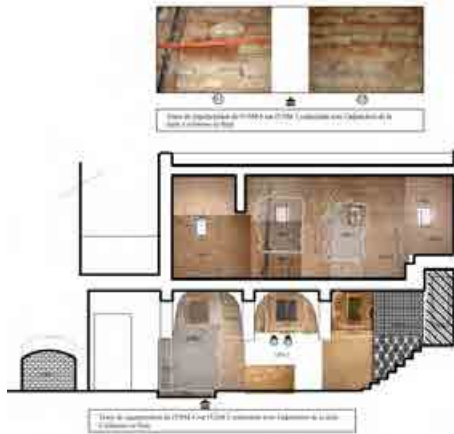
The Janissary bath: stratigraphy of masonry units in section DD (Author, 2008).
